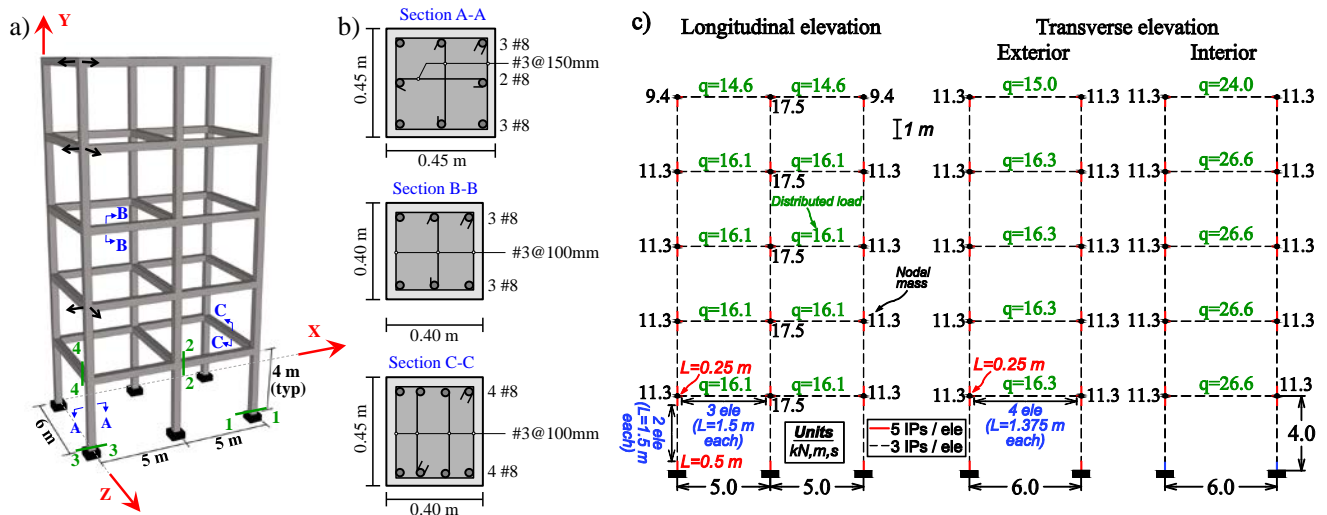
RC frame building: (a) Isometric view (black arrows indicate the locations and directions of the measured acceleration responses), (b) Cross-sections of beams and columns, (c) Finite element model.
